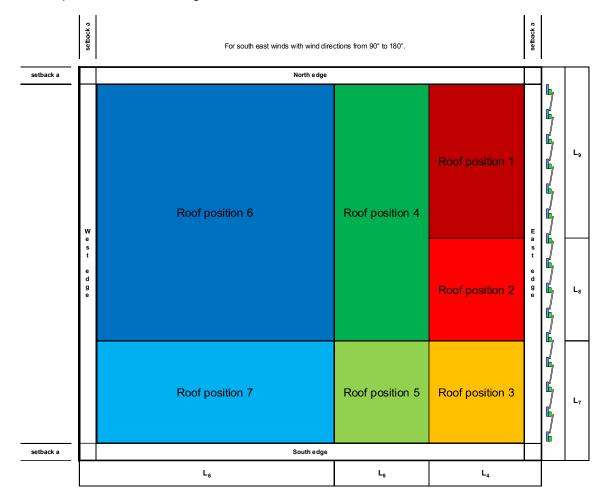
Definition of roof zones for the solar ballasted roof mount system "FastRack 510" with a minimum offset "*a*" from the roof edges equal to or greater than 1.0 m and for south east winds from 90° to 180°; valid for flat-roofed buildings with a maximum roof angle of 7°
